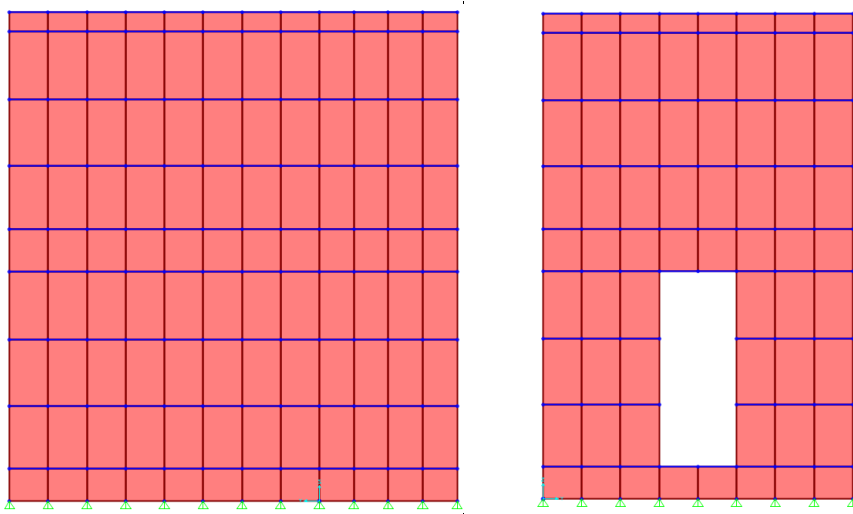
House PL model elevation view, walls along Y axis: Exterior wall (left),Interior wall (right)
